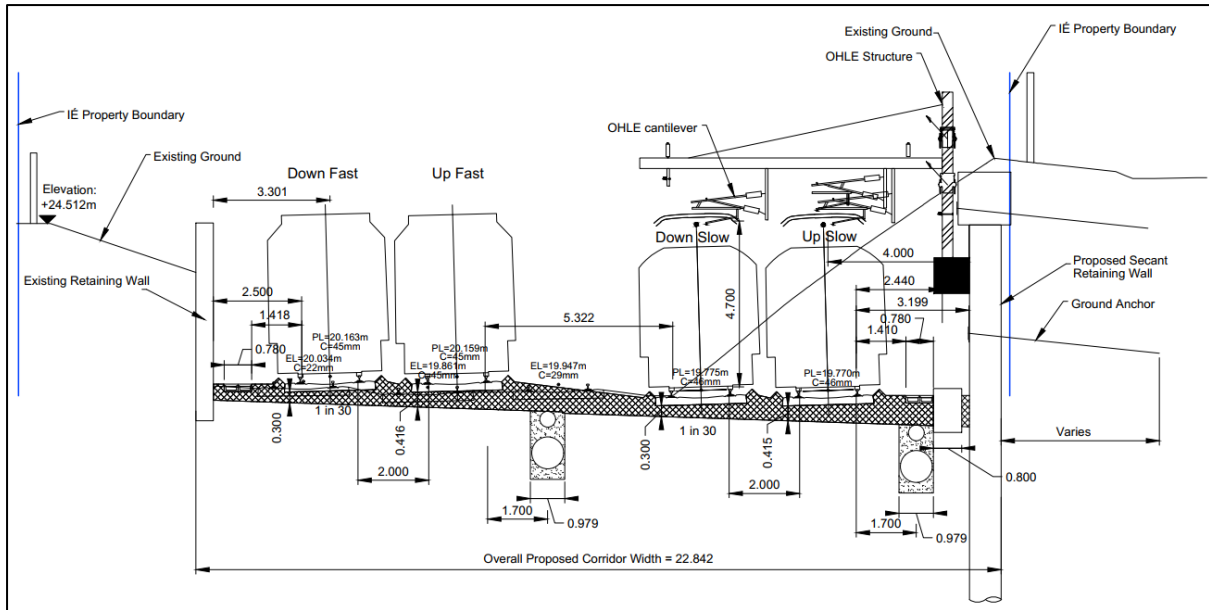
Cross Section West of Memorial Road Bridge - Facing West
